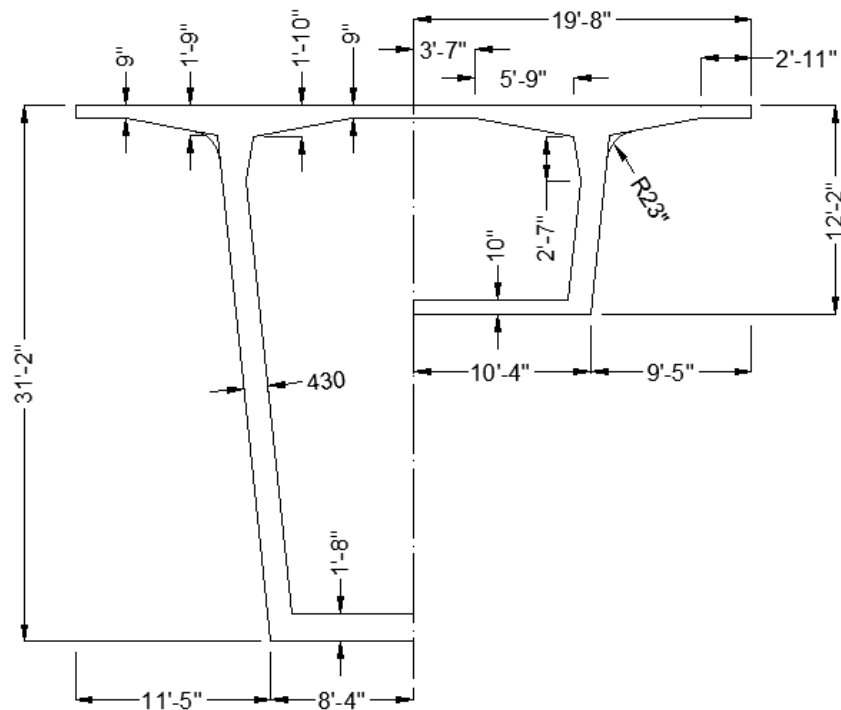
Smart Road Bridge Maximum (left) and Minimum (right) Cross Sections
